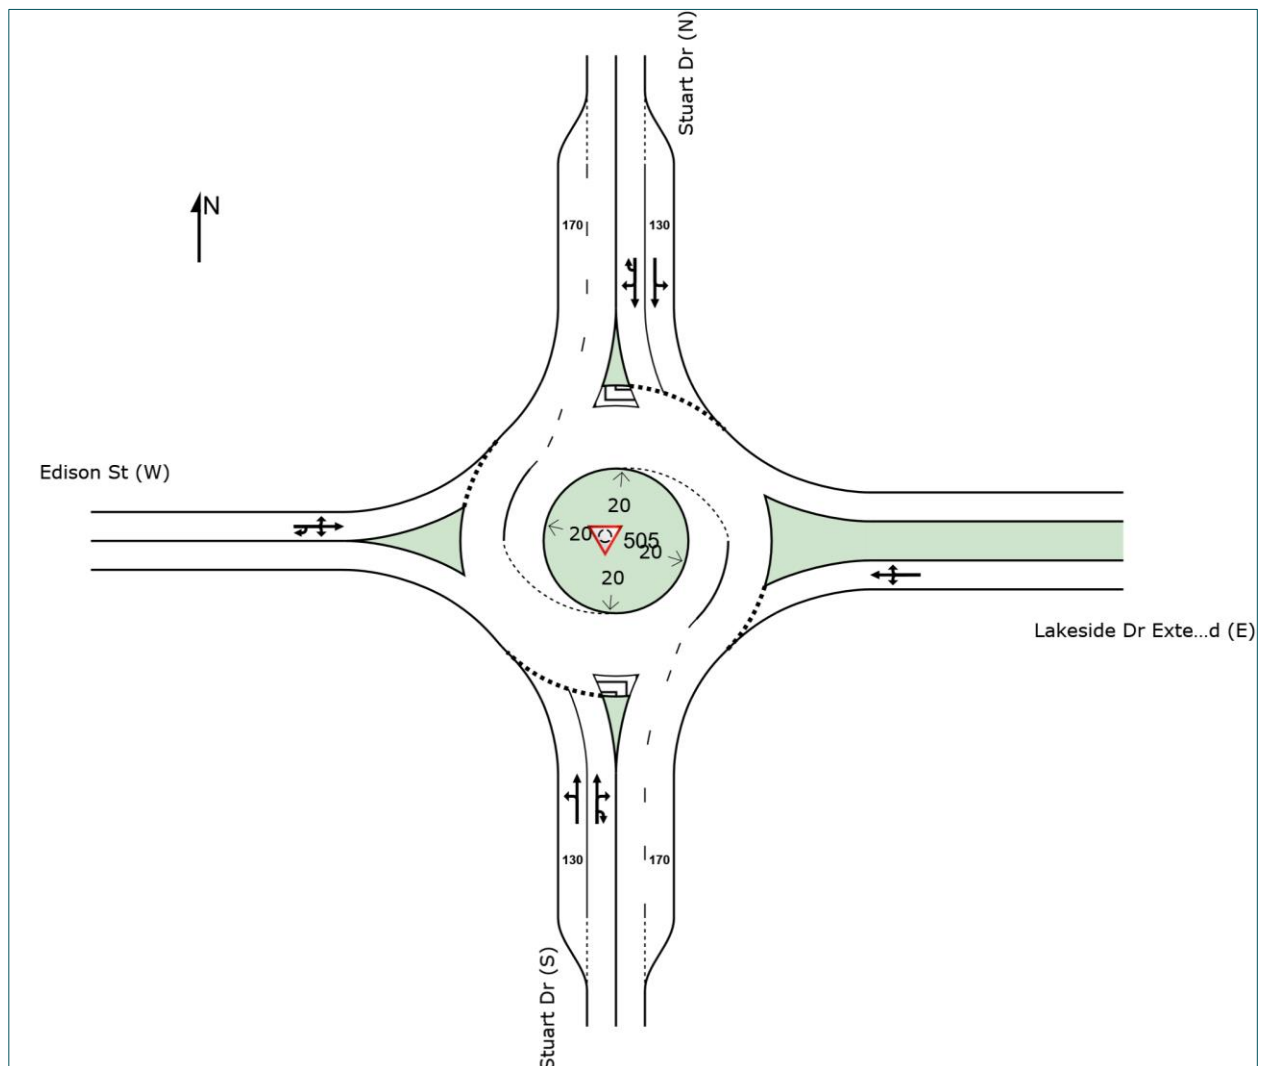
Stuart Drive / Lakeside Drive extended / Edison Street roundabout SIDRA layout
